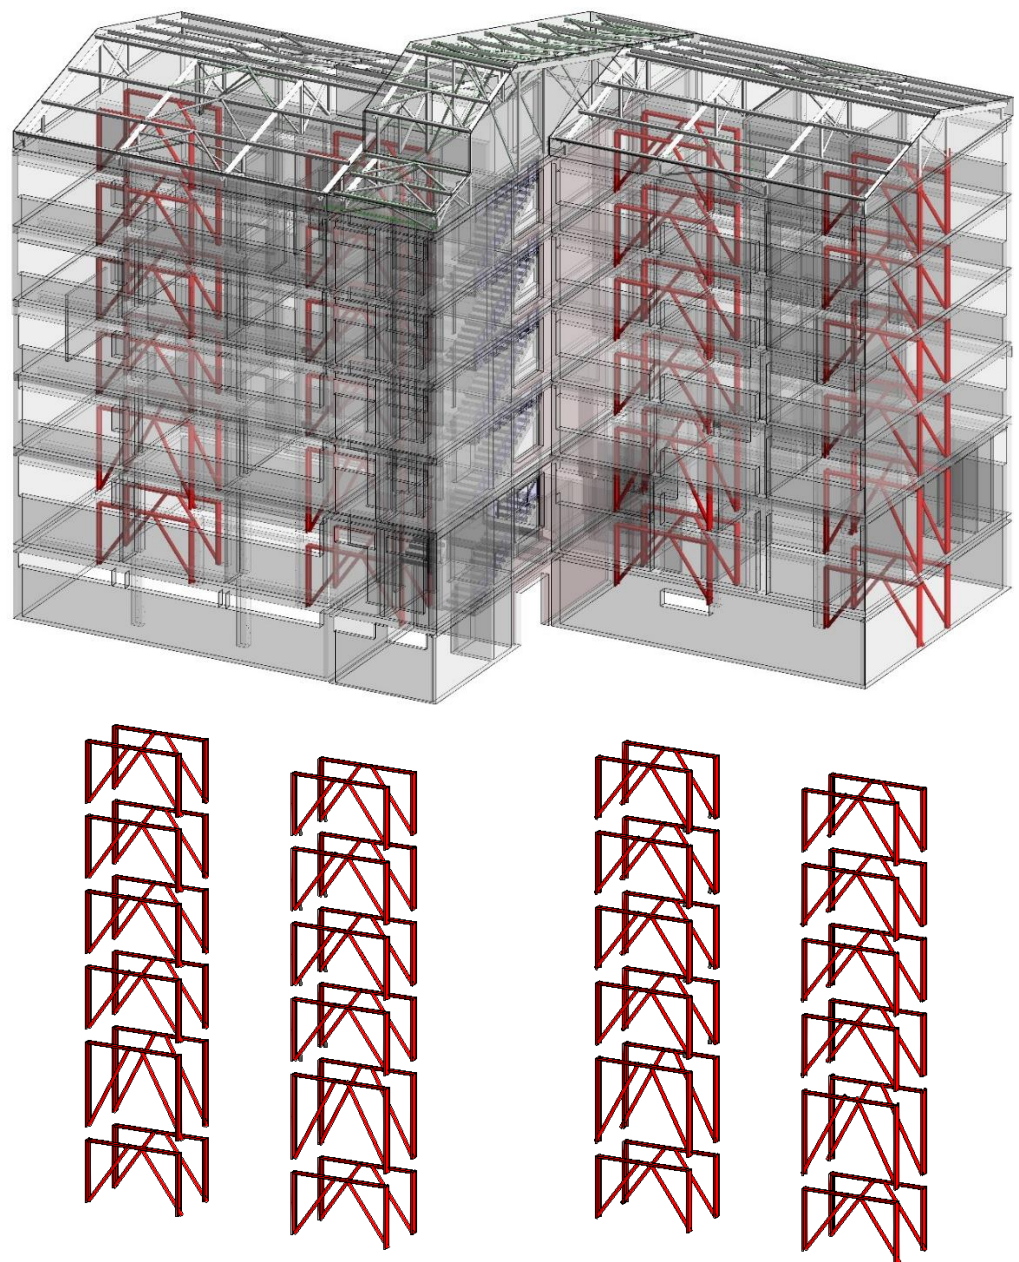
New steel frames (red) installed as an infill of existing RC frames.
